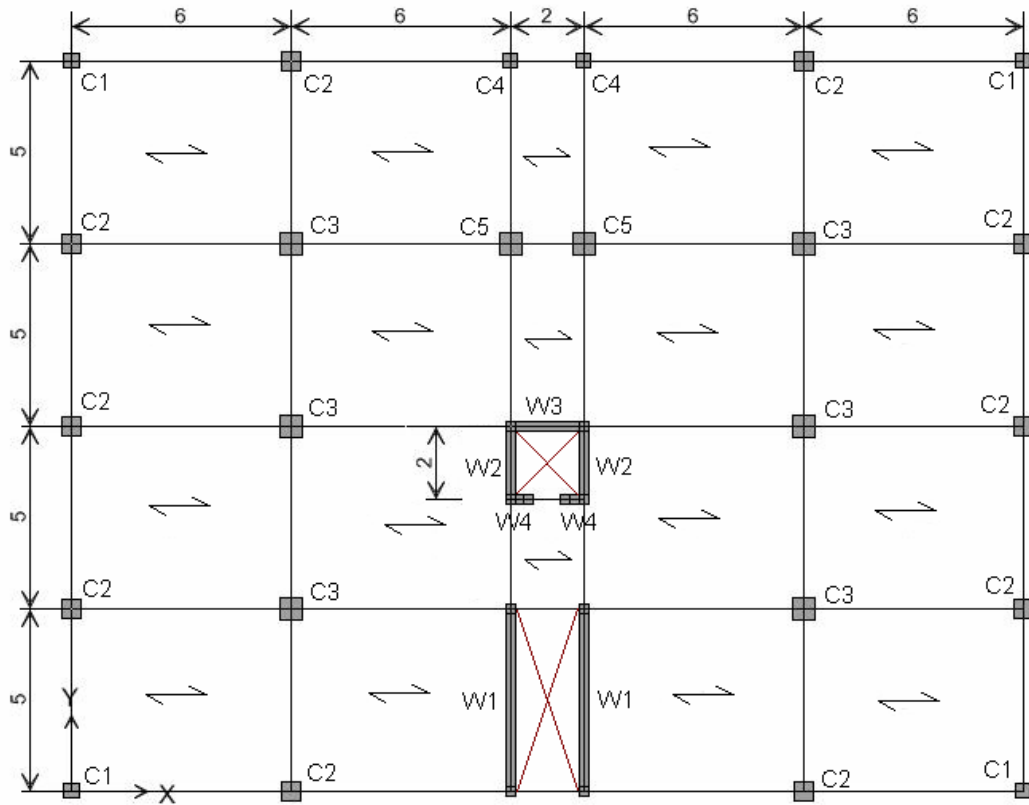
Plan layout for Model # 1 (F4RC)
